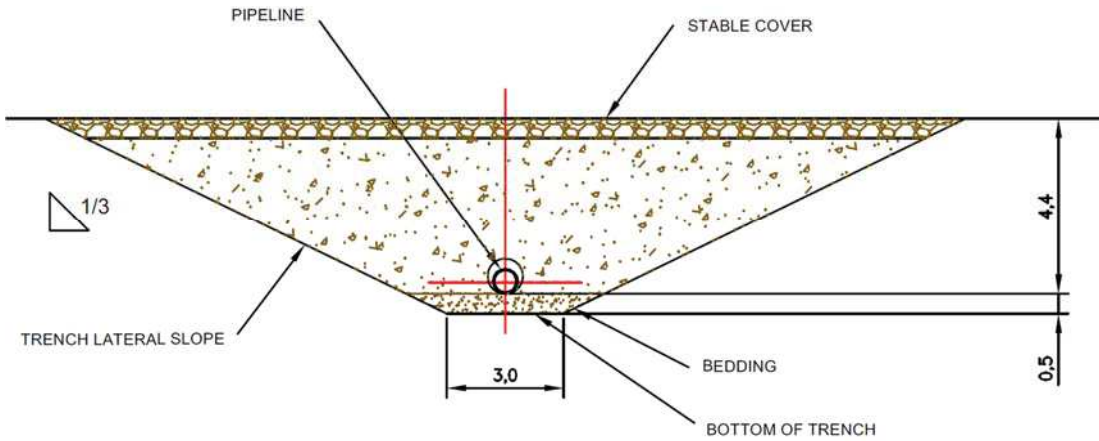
Example of trench cross section at HDD exit point at the Gela landfall site
